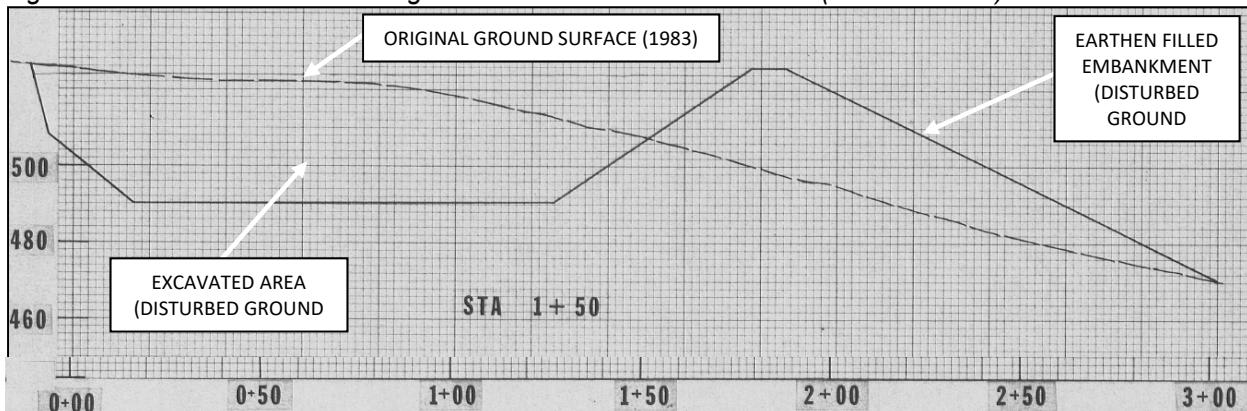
Kokila Reservoir Grading Plan Cross Section at STA 1+50 (from As-Builts)
